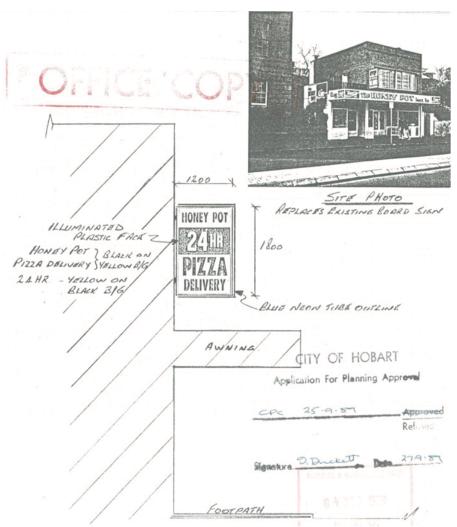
Site photo and diagram illustrating proposed vertical projecting wall sign assessed under PLN-890825 (1989). *Source Tasmanian State Archives
